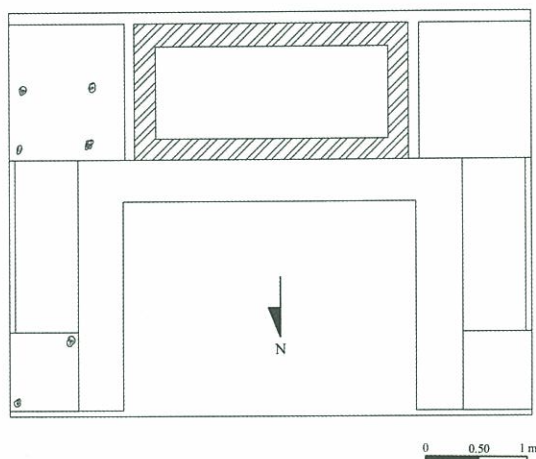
Idebessos, tomb with exedra 1, plan, facade elevation.
